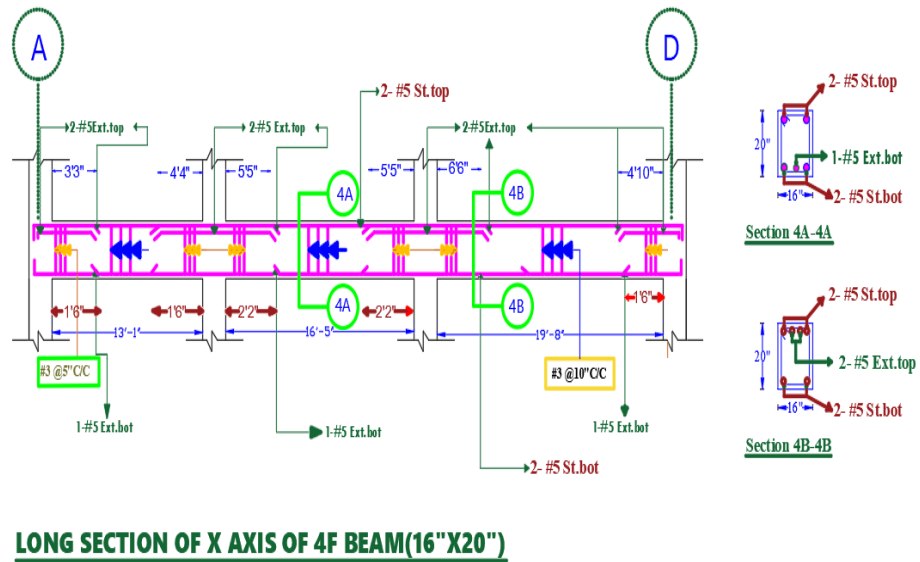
Long and Cross Sections of X Axis of 4<sup>TH</sup> Floor Beam (16" X 20")
